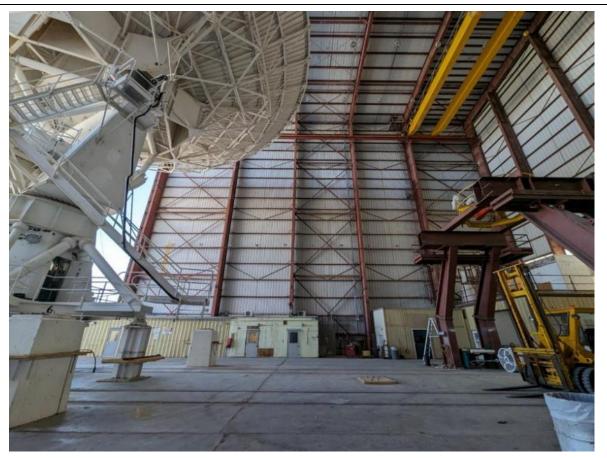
Inside view of Antenna Barn facing east wall with 6 columns.
